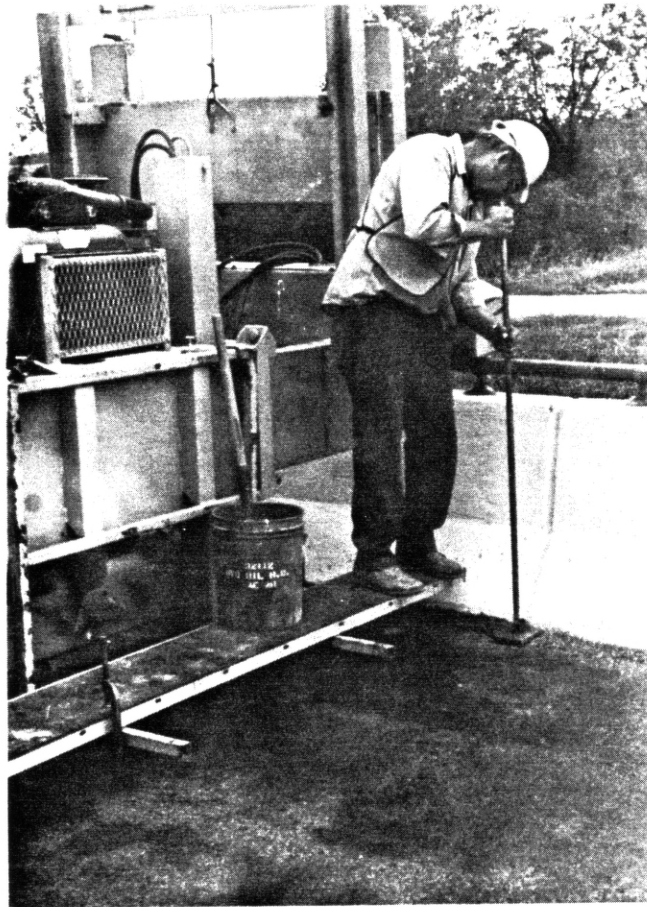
The paving machine could not compact the last 4 in (10cm) against the parapet wall.
